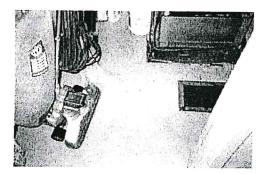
shows mechanical room where plywood has been installed to cover ACM sheet vinyl.
